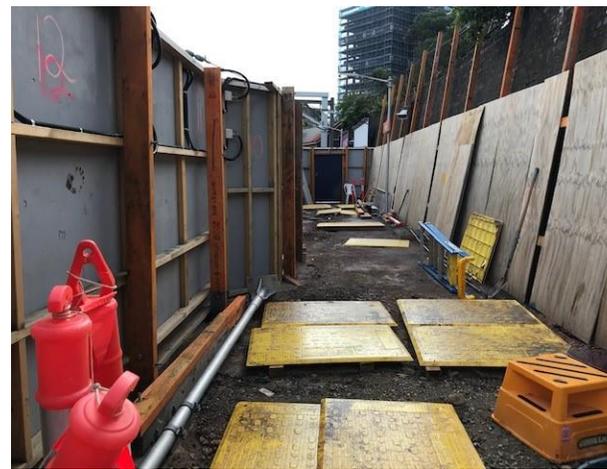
Works at Platform 10 – Heritage protection was installed at the retaining wall with signage posted on the plyboards.
